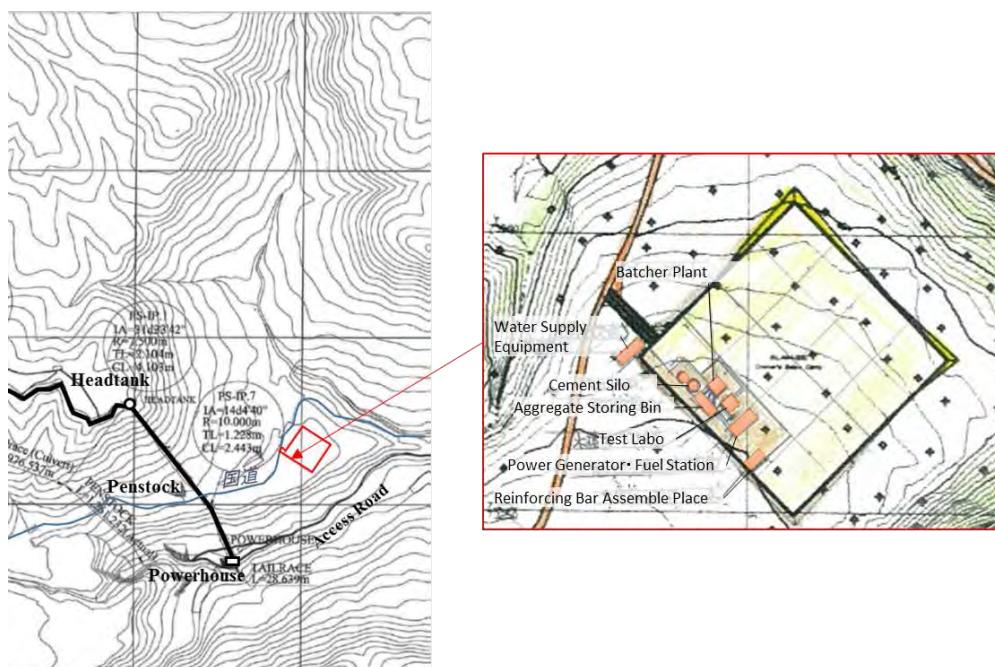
Layout of Batcher Plant No.2 (Downstream area)
